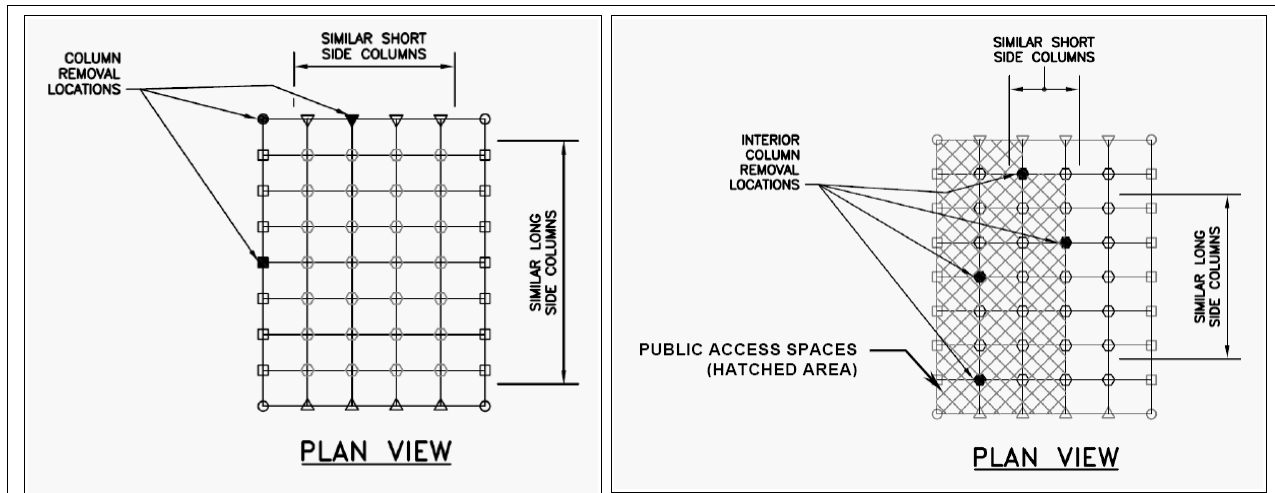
Location of external and internal columns to notionally remove in the Alternate Load Path analysis, according to DoD UFC 4-023-03. Similar schematics are given for load-bearing wall structures. (Source: [12]).
